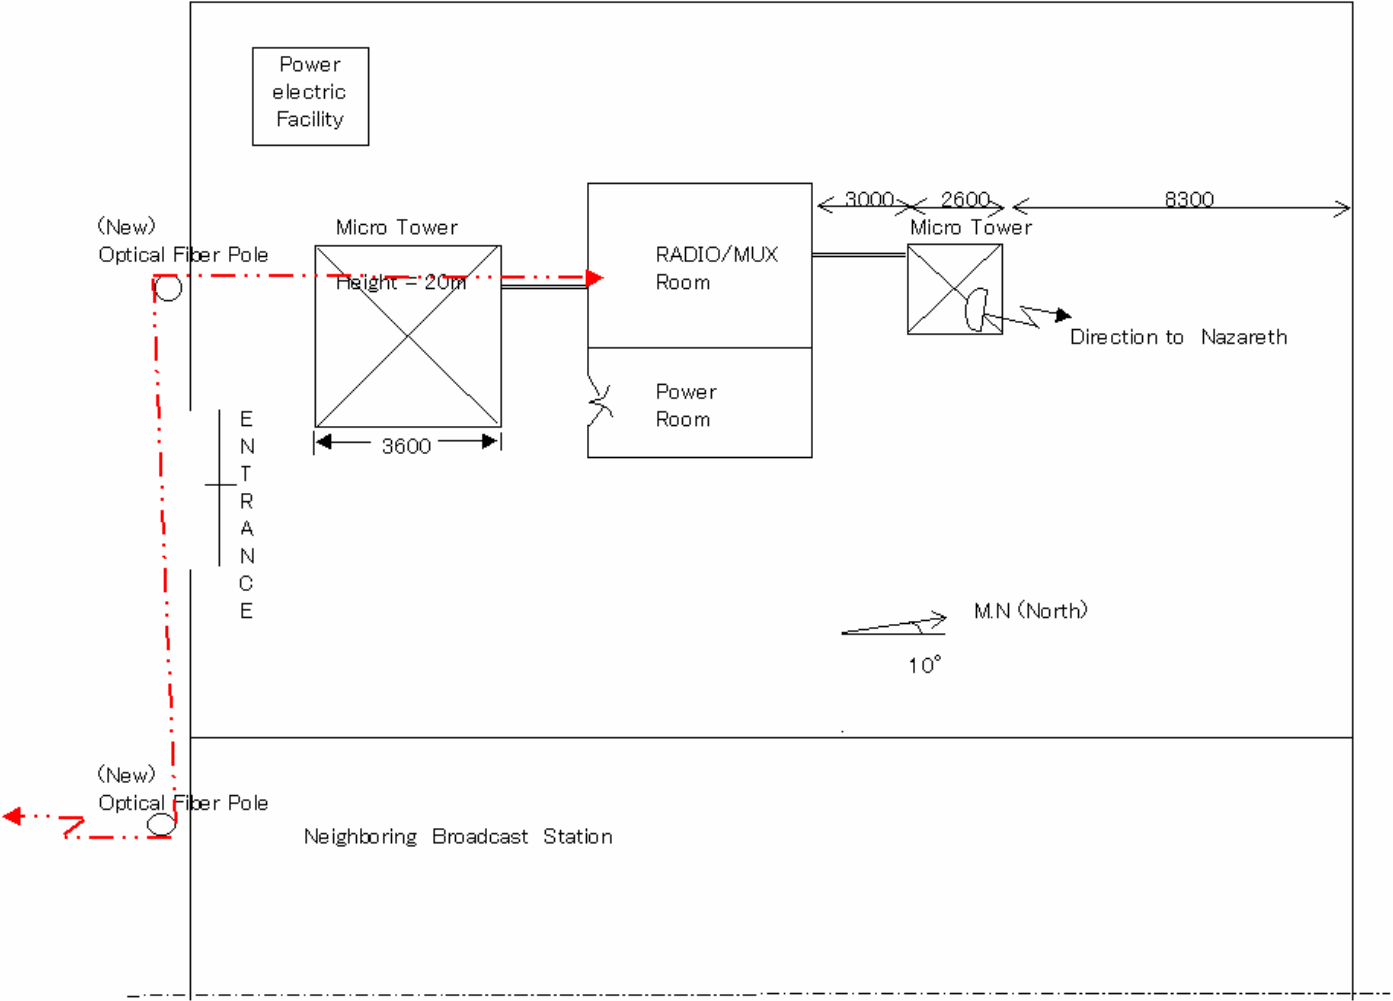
ADAMA WEST MW Rep. Cable Laying Point
